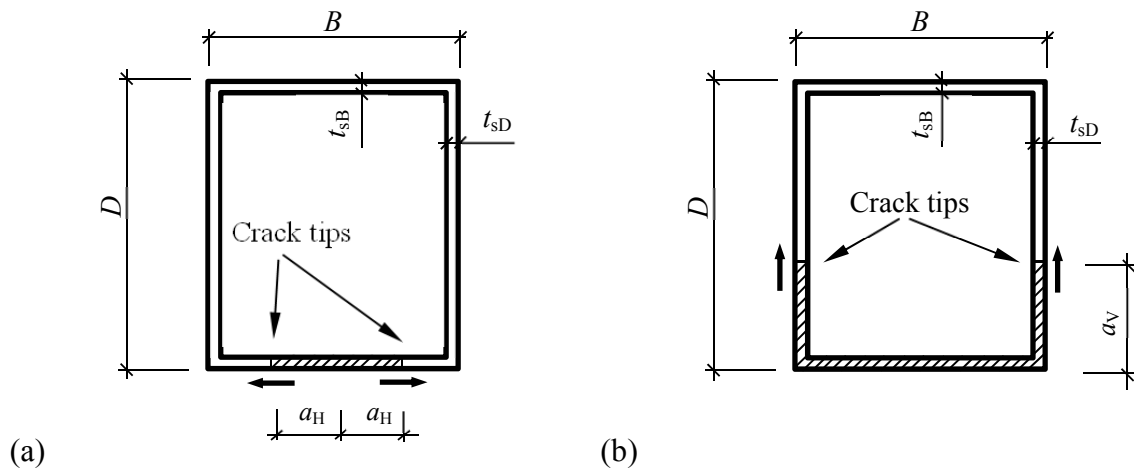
Crack development of box beam section. (a) Stage 1; (b) Stage 2.
